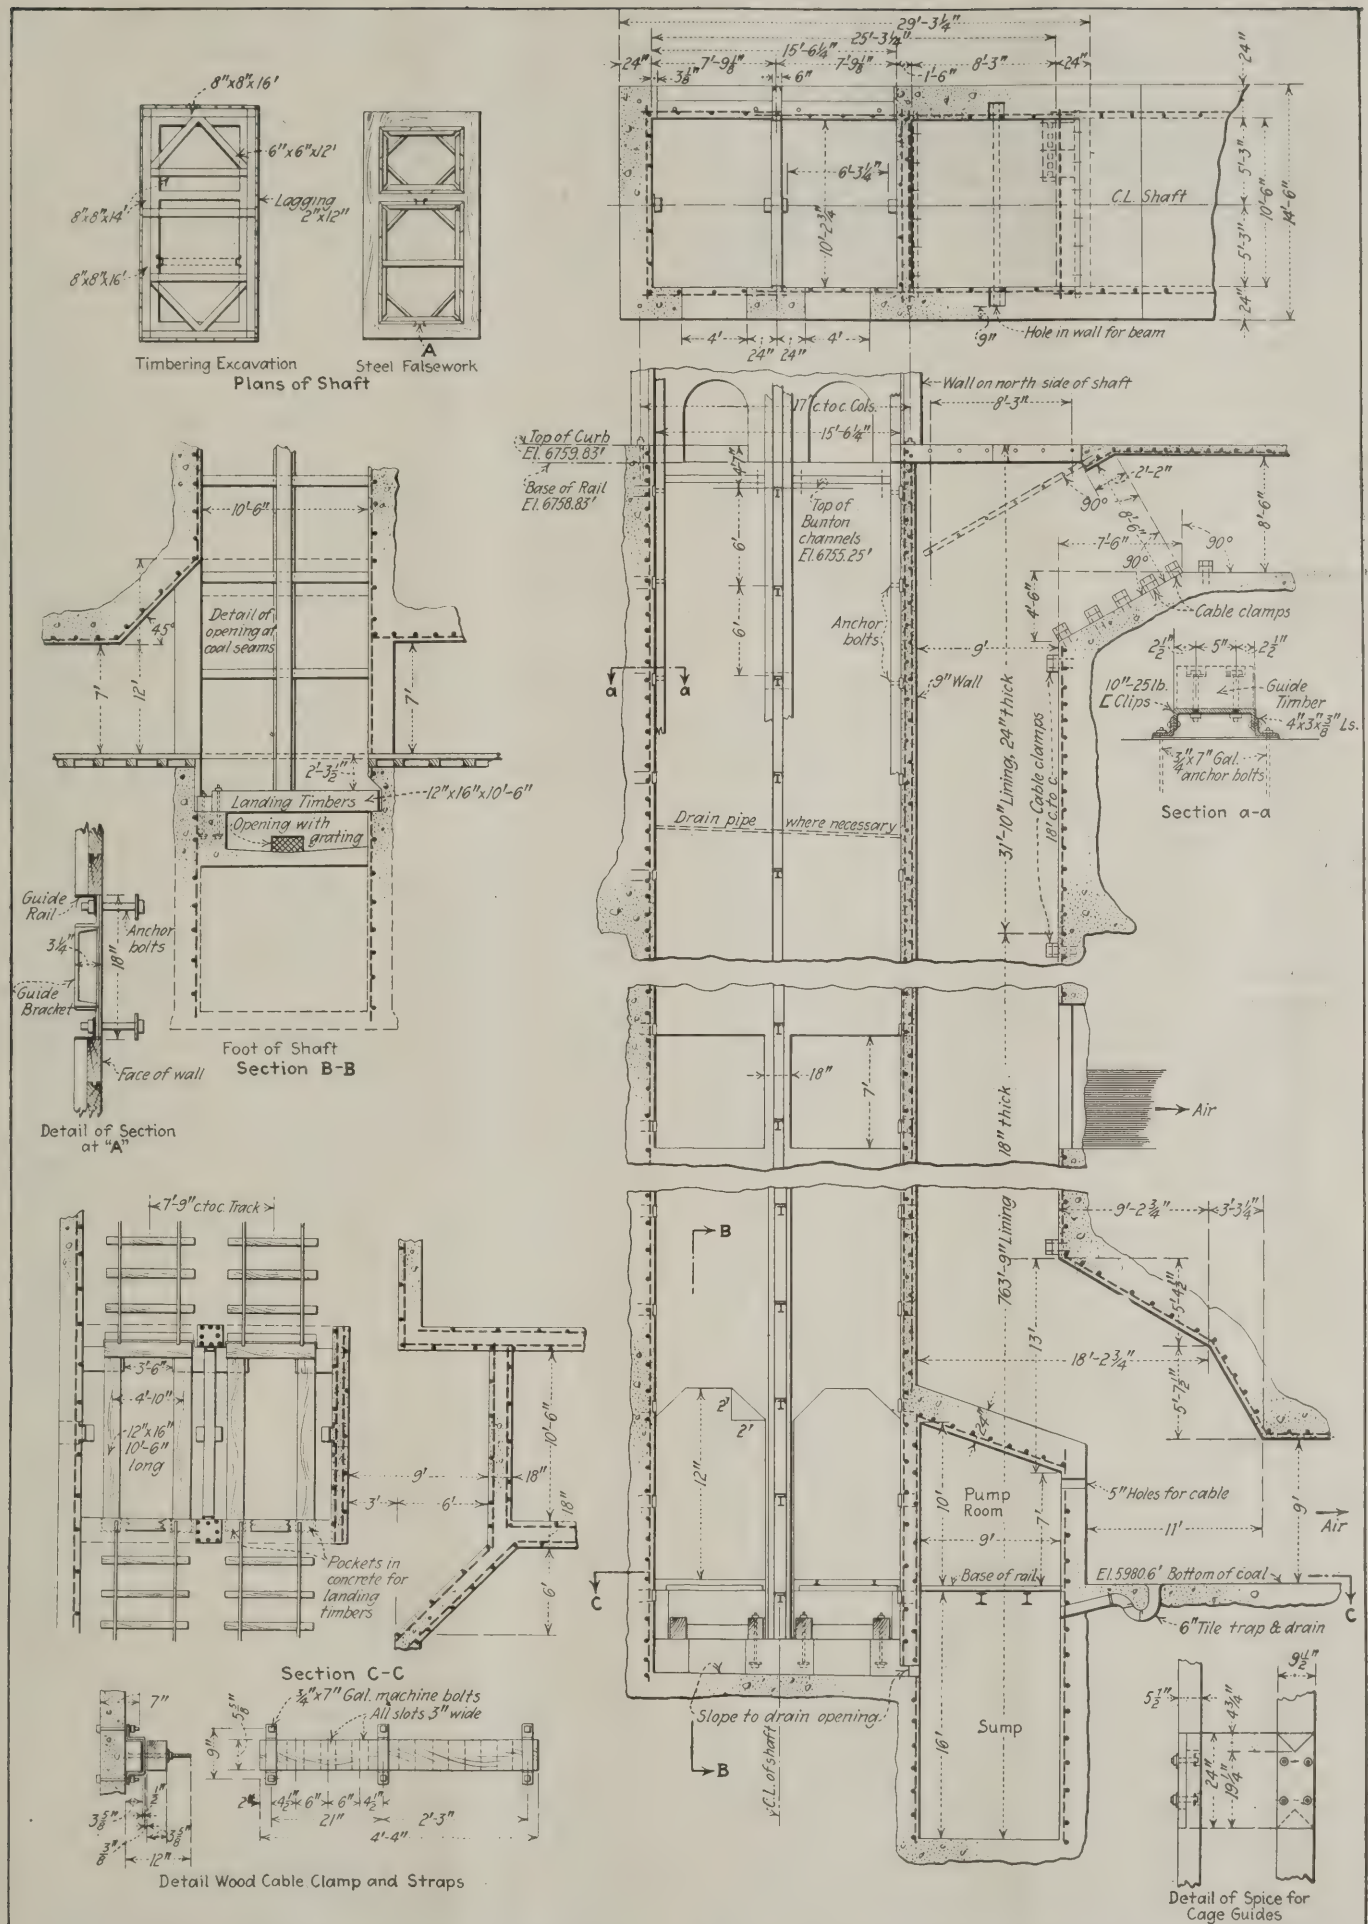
CROSS-SECTIONS AND DETAILS OF MAN-AND-MATERIAL SHAFT SHOWING BOTH COMPLETED AND FALSE WORK
